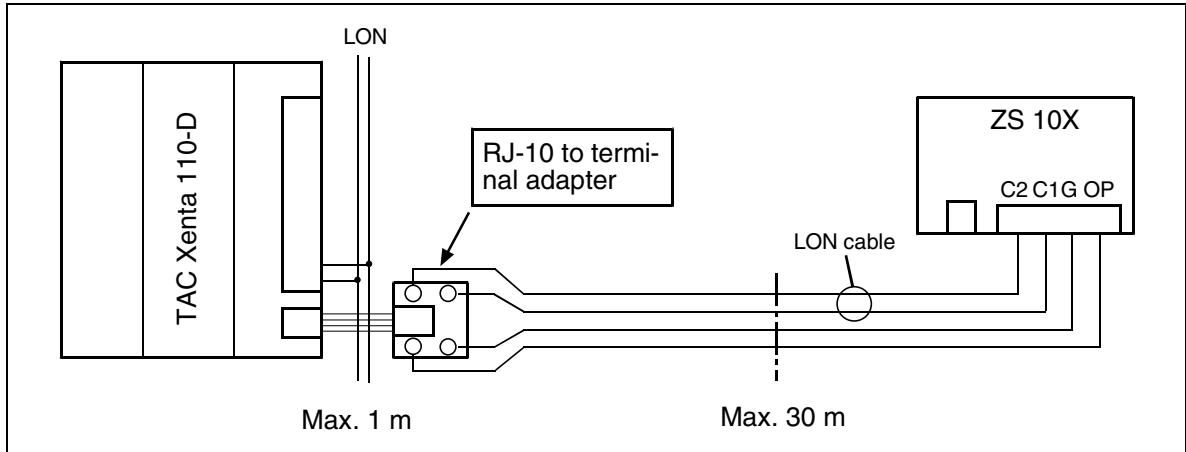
TAC Xenta OP to wall module connection, alternative 1
